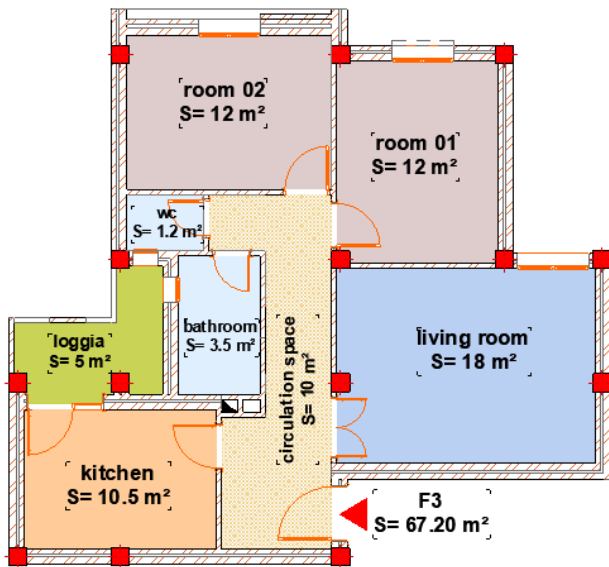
Typical floor plan of a collective social housing project (LPL). (Source: ACAD design firm, 2023)
